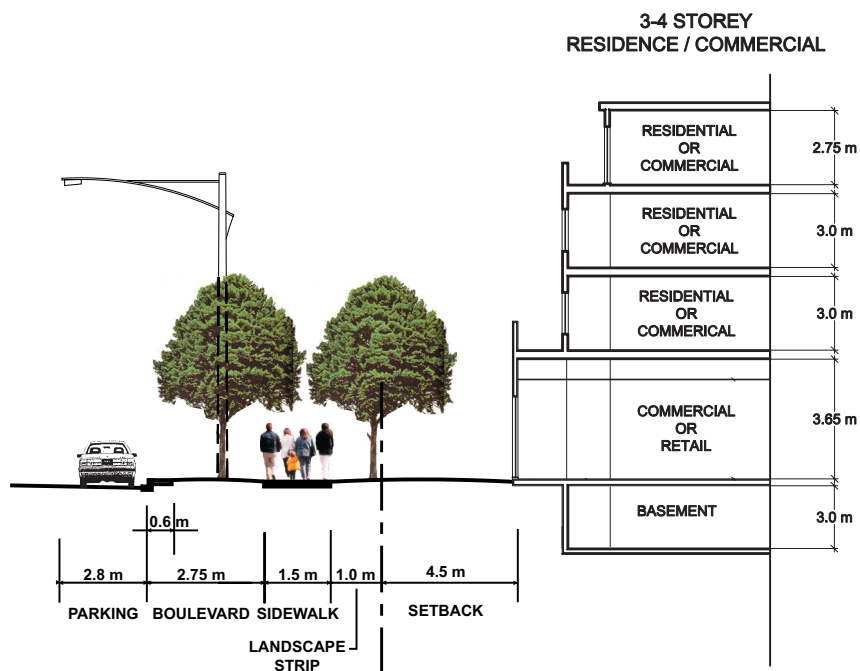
Sections illustrating potential 4 storey mixed-use buildings.
